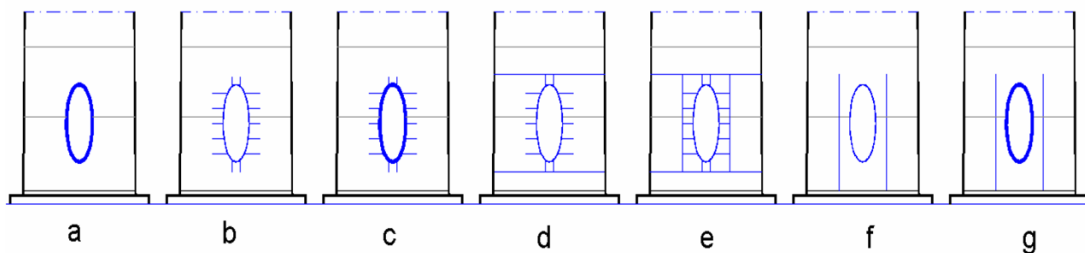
Reinforcement concepts for high strength steel wind turbine towers. (Veljkovic et al., 2012)
